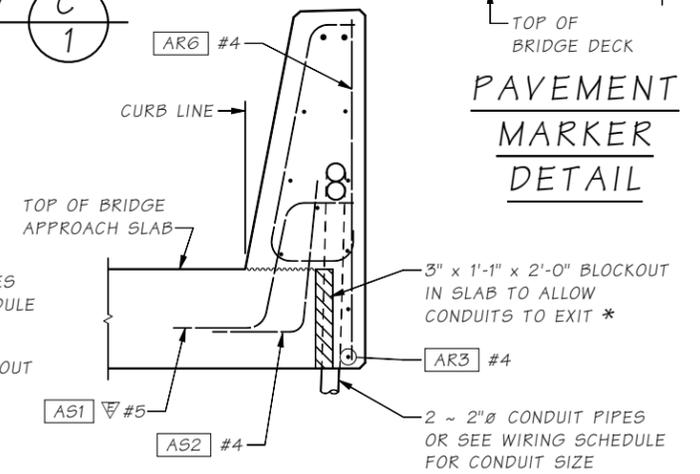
DETAIL FOR BRIDGE FOR DETAILS NOT SHOWN SEE "OUTSIDE ELEVATION" AND "TYPICAL SECTION - TRAFFIC BARRIER"
